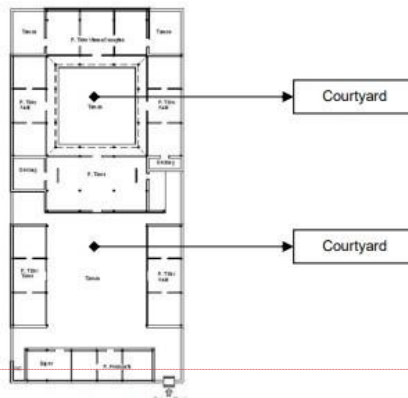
Traditional Chinese Building Floor Plan (Source: Handinoto, 2008)
